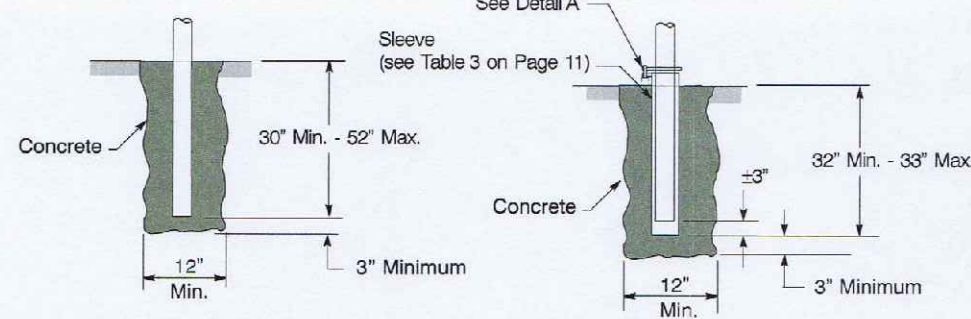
Footing for Fixed Steel Post Detail (see Table 4)
